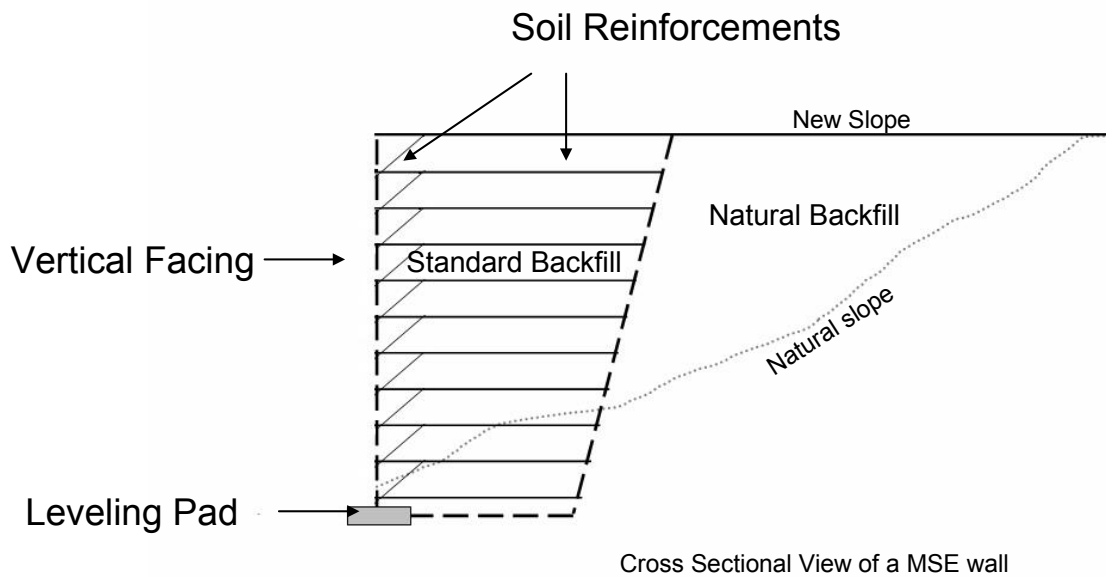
Schematic of a cross sectional view of a typical mechanically stabilized earth wall
